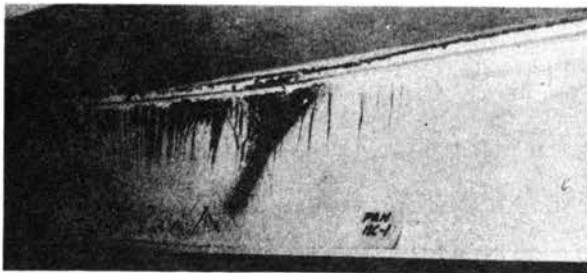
View of Beam 14b before removal from testing machine. Note the slip and separation between steel shape and concrete slab. The deep compression-type yield lines occurred after the shear failure took place and the steel beam flange buckled laterally while the web buckled locally. The absence of tension yield lines above the middle of the web is apparent. The beam did not reach its calculated M_u .
